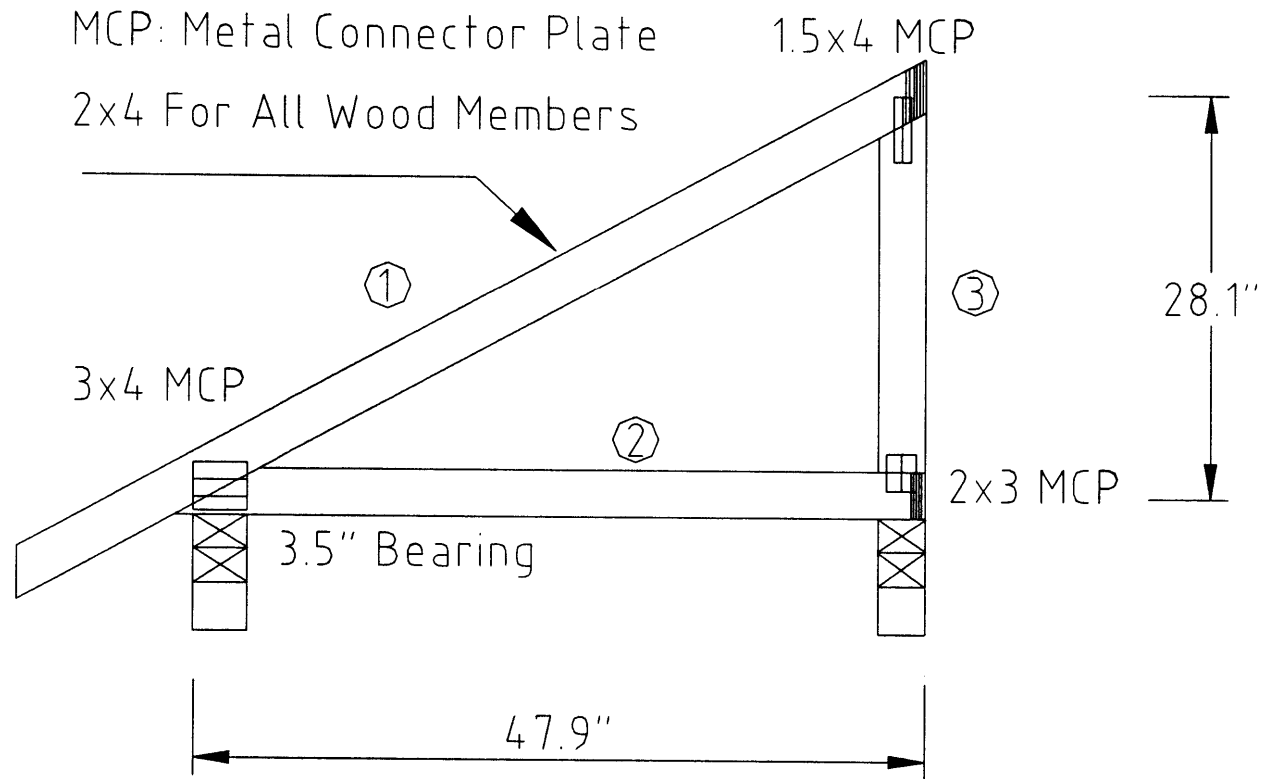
MPC Truss Type J2 from a Truss Plate Manufacturer
